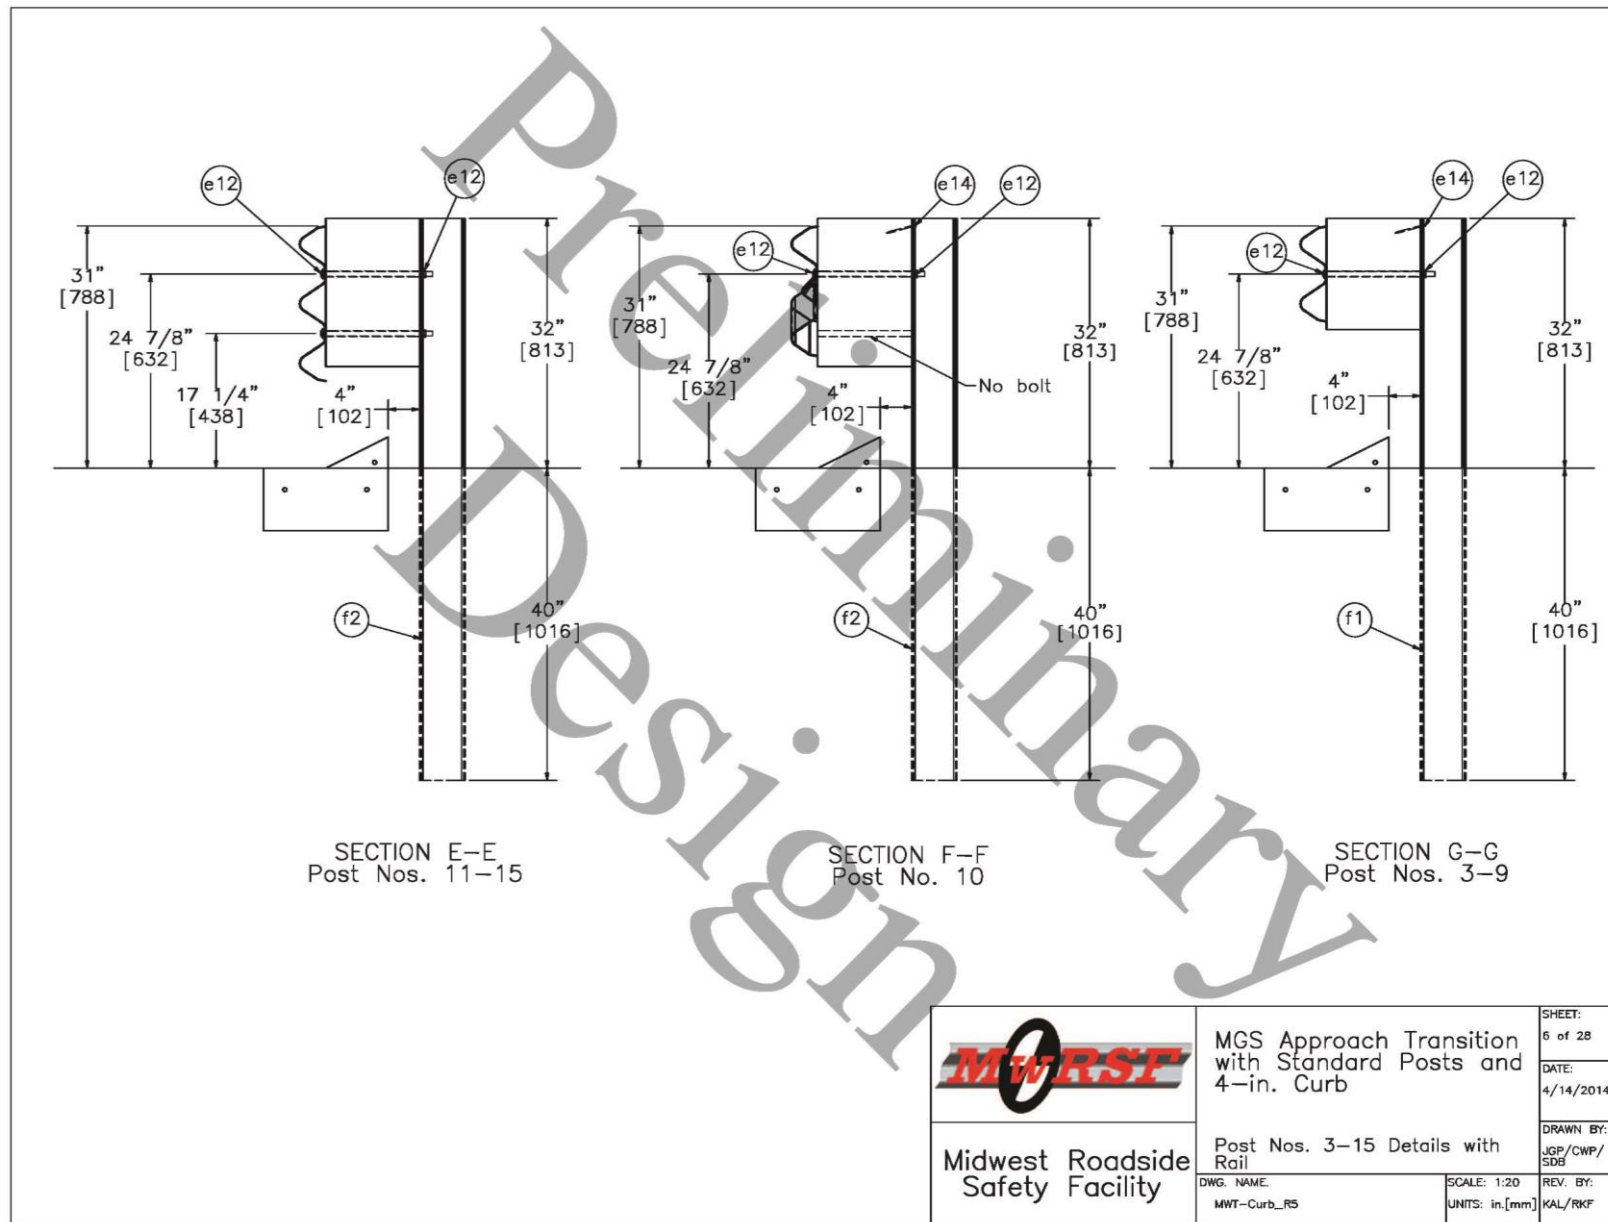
Post Nos. 3 through 15 Details with Rail, Test No. MWTC-1
